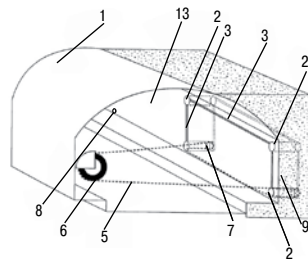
Tunnel of the design profile, four boreholes, two parallel strips cut in the perpendicular plane, one strip cut in the parallel plane and the rotation tool
